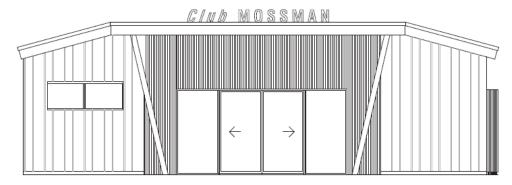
Front Elevation - B&W Signage Sketch (in isolated context)
